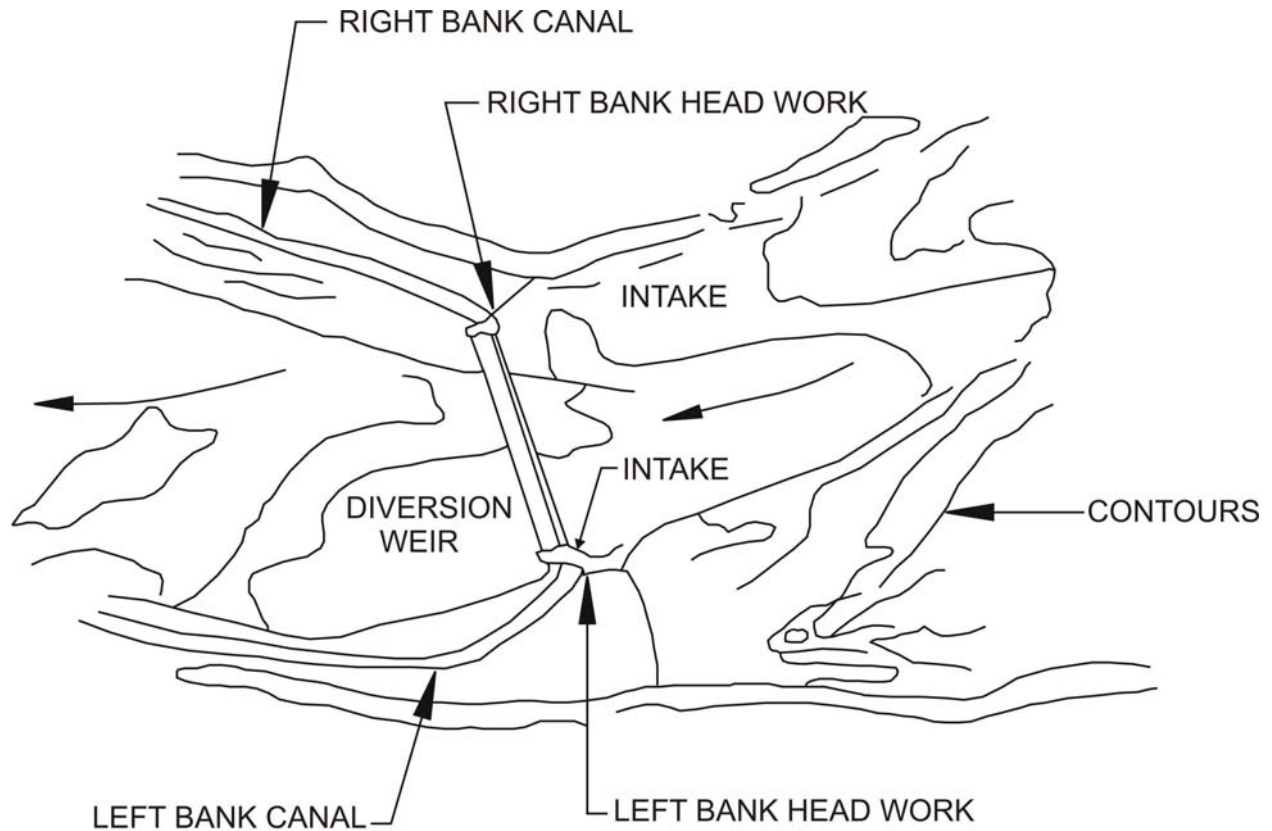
RUN-OFF RIVER TYPE INTAKE (GENERAL LAYOUT)
